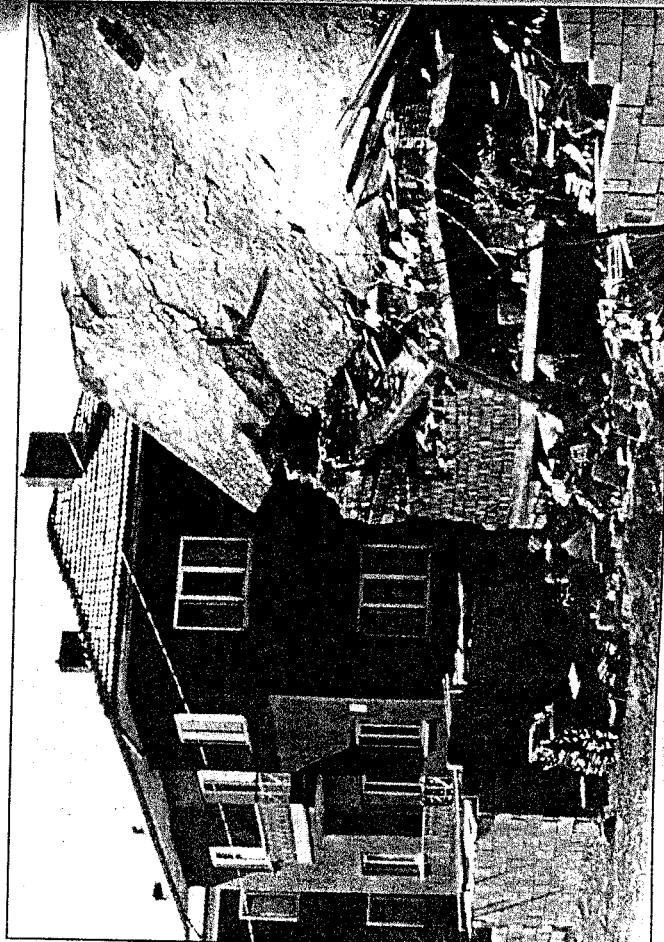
Example of older residential URM masonry buildings that have survived intact, next to a new building collapsed while under construction
